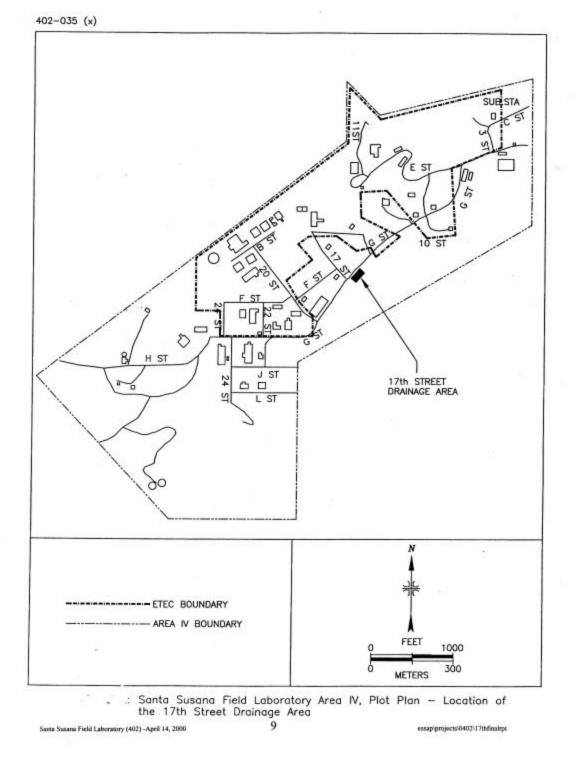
Santa Susana Field Laboratory Area IV, Plot Plan – Location of the 17th Street Drainage Area
